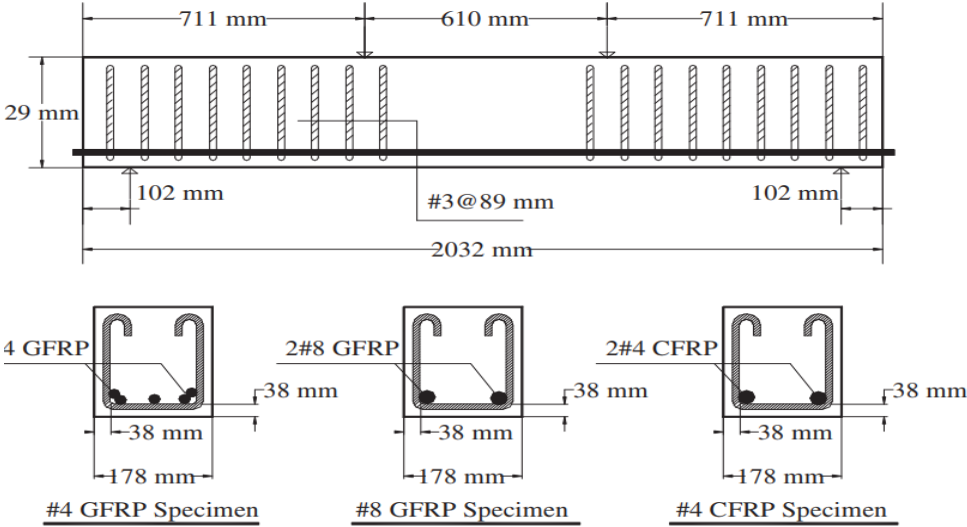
1: Beam specimen details (Wang and Belarbi, 2010)
